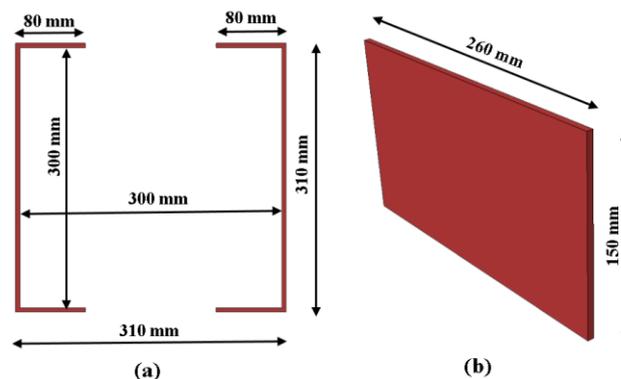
(a) Details of the two C-channels steel cage; (b) The connecting Batten plate.
